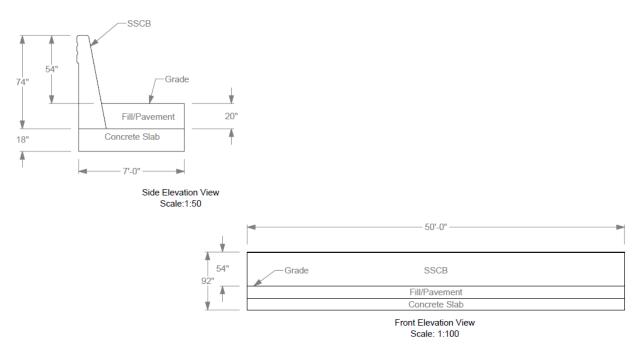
Concept 5 – Moment Slab with Fill/Pavement Overlay Design.
